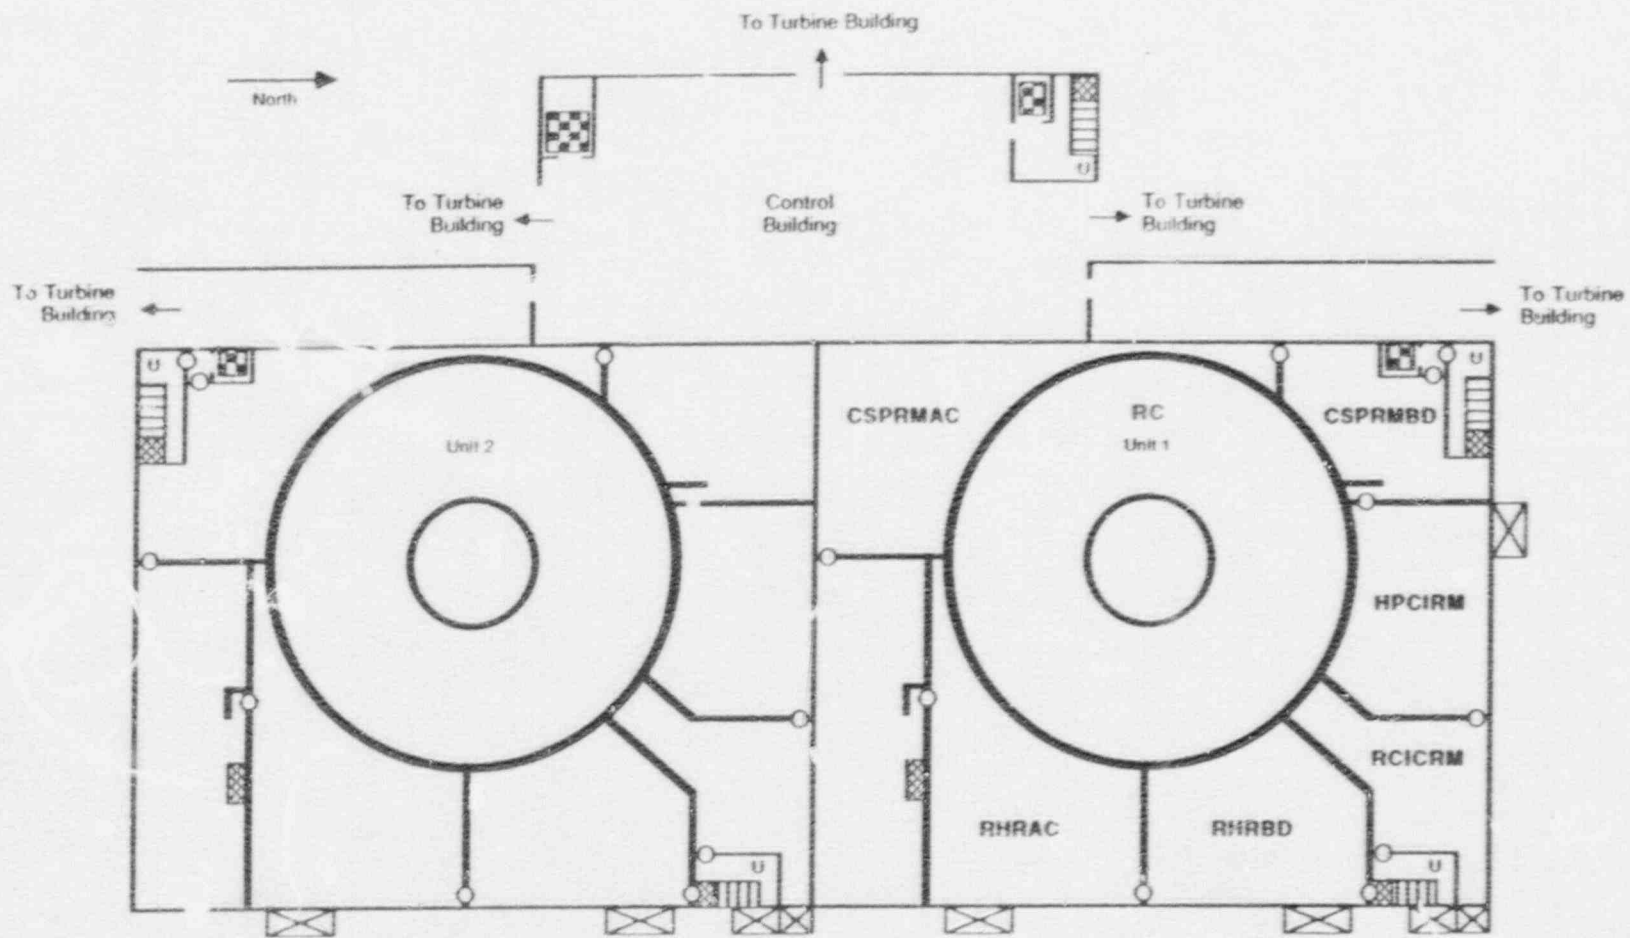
Susquehanna 1 and 2 Reactor Building, Elevation 645' and Control Building, Elevation 645'
